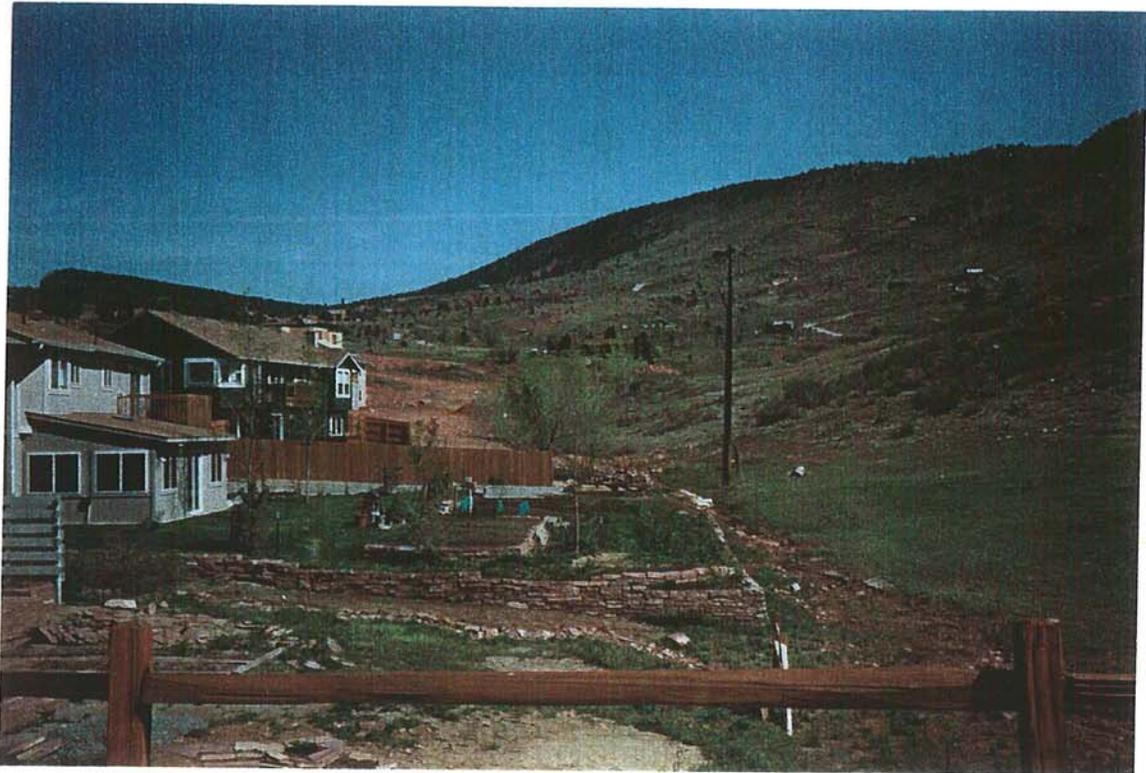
View of the upper Steamboat Valley drainage basin. Photo taken from the former railroad embankment (now a driveway) that has created a stormwater detention pond, which has historically served to protect downstream properties from peak runoff flows. Unfortunately, development has been allowed to occur within the high water mark of the pond. The built-up landscaping and walkout basements could be inundated in a major stormwater event.
